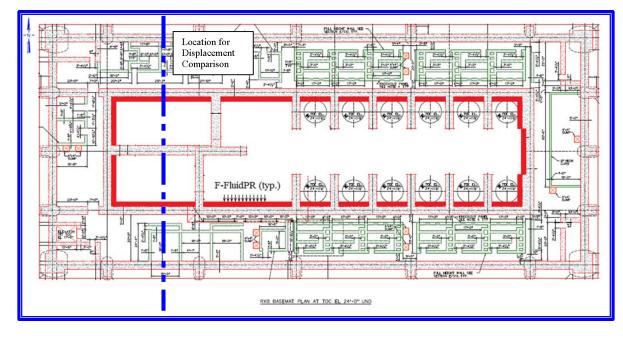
RXB Plan View Showing Hydrodynamic Loading on Pool Walls (in red).
